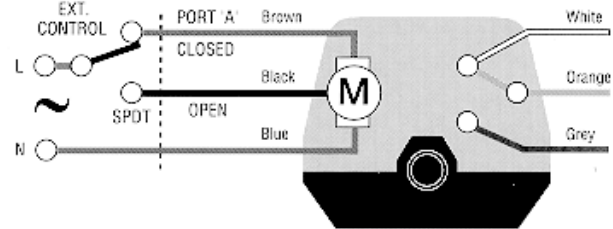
2 Wire + Common Version VC Valve Actuator with Molex Connector for SPST controller
